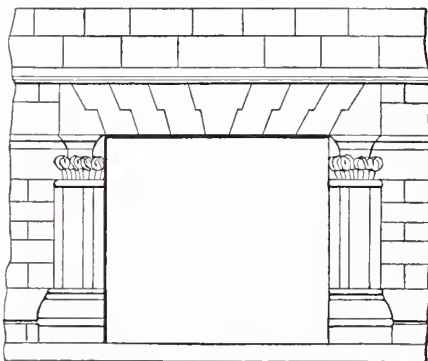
Chimney in Coningburgh Castle, Yorkshire.
